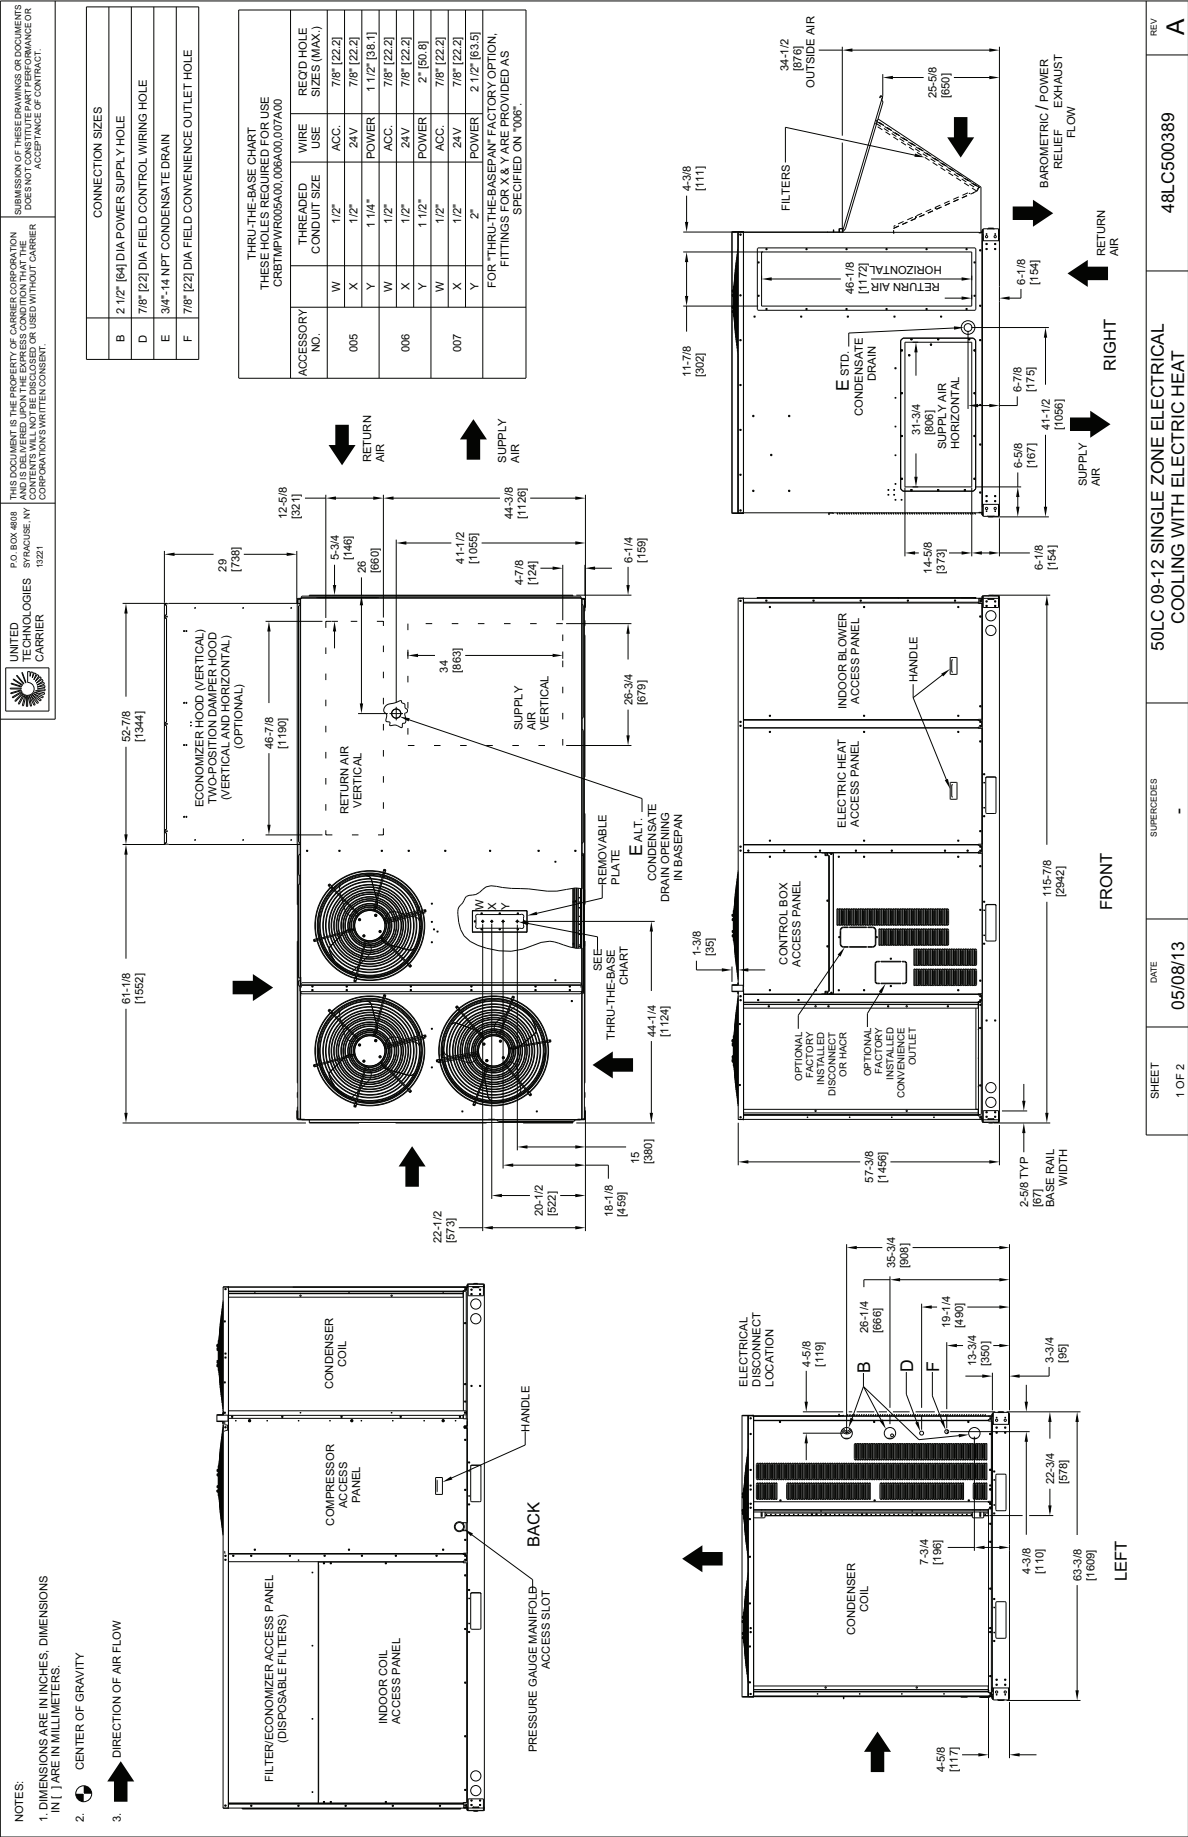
Unit Dimensional Drawing, Size 08 Unit
